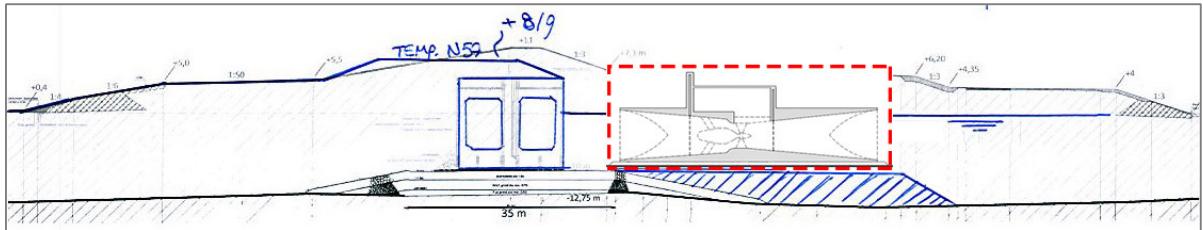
Variant 1B 'Building in the wet' cross-section during construction
